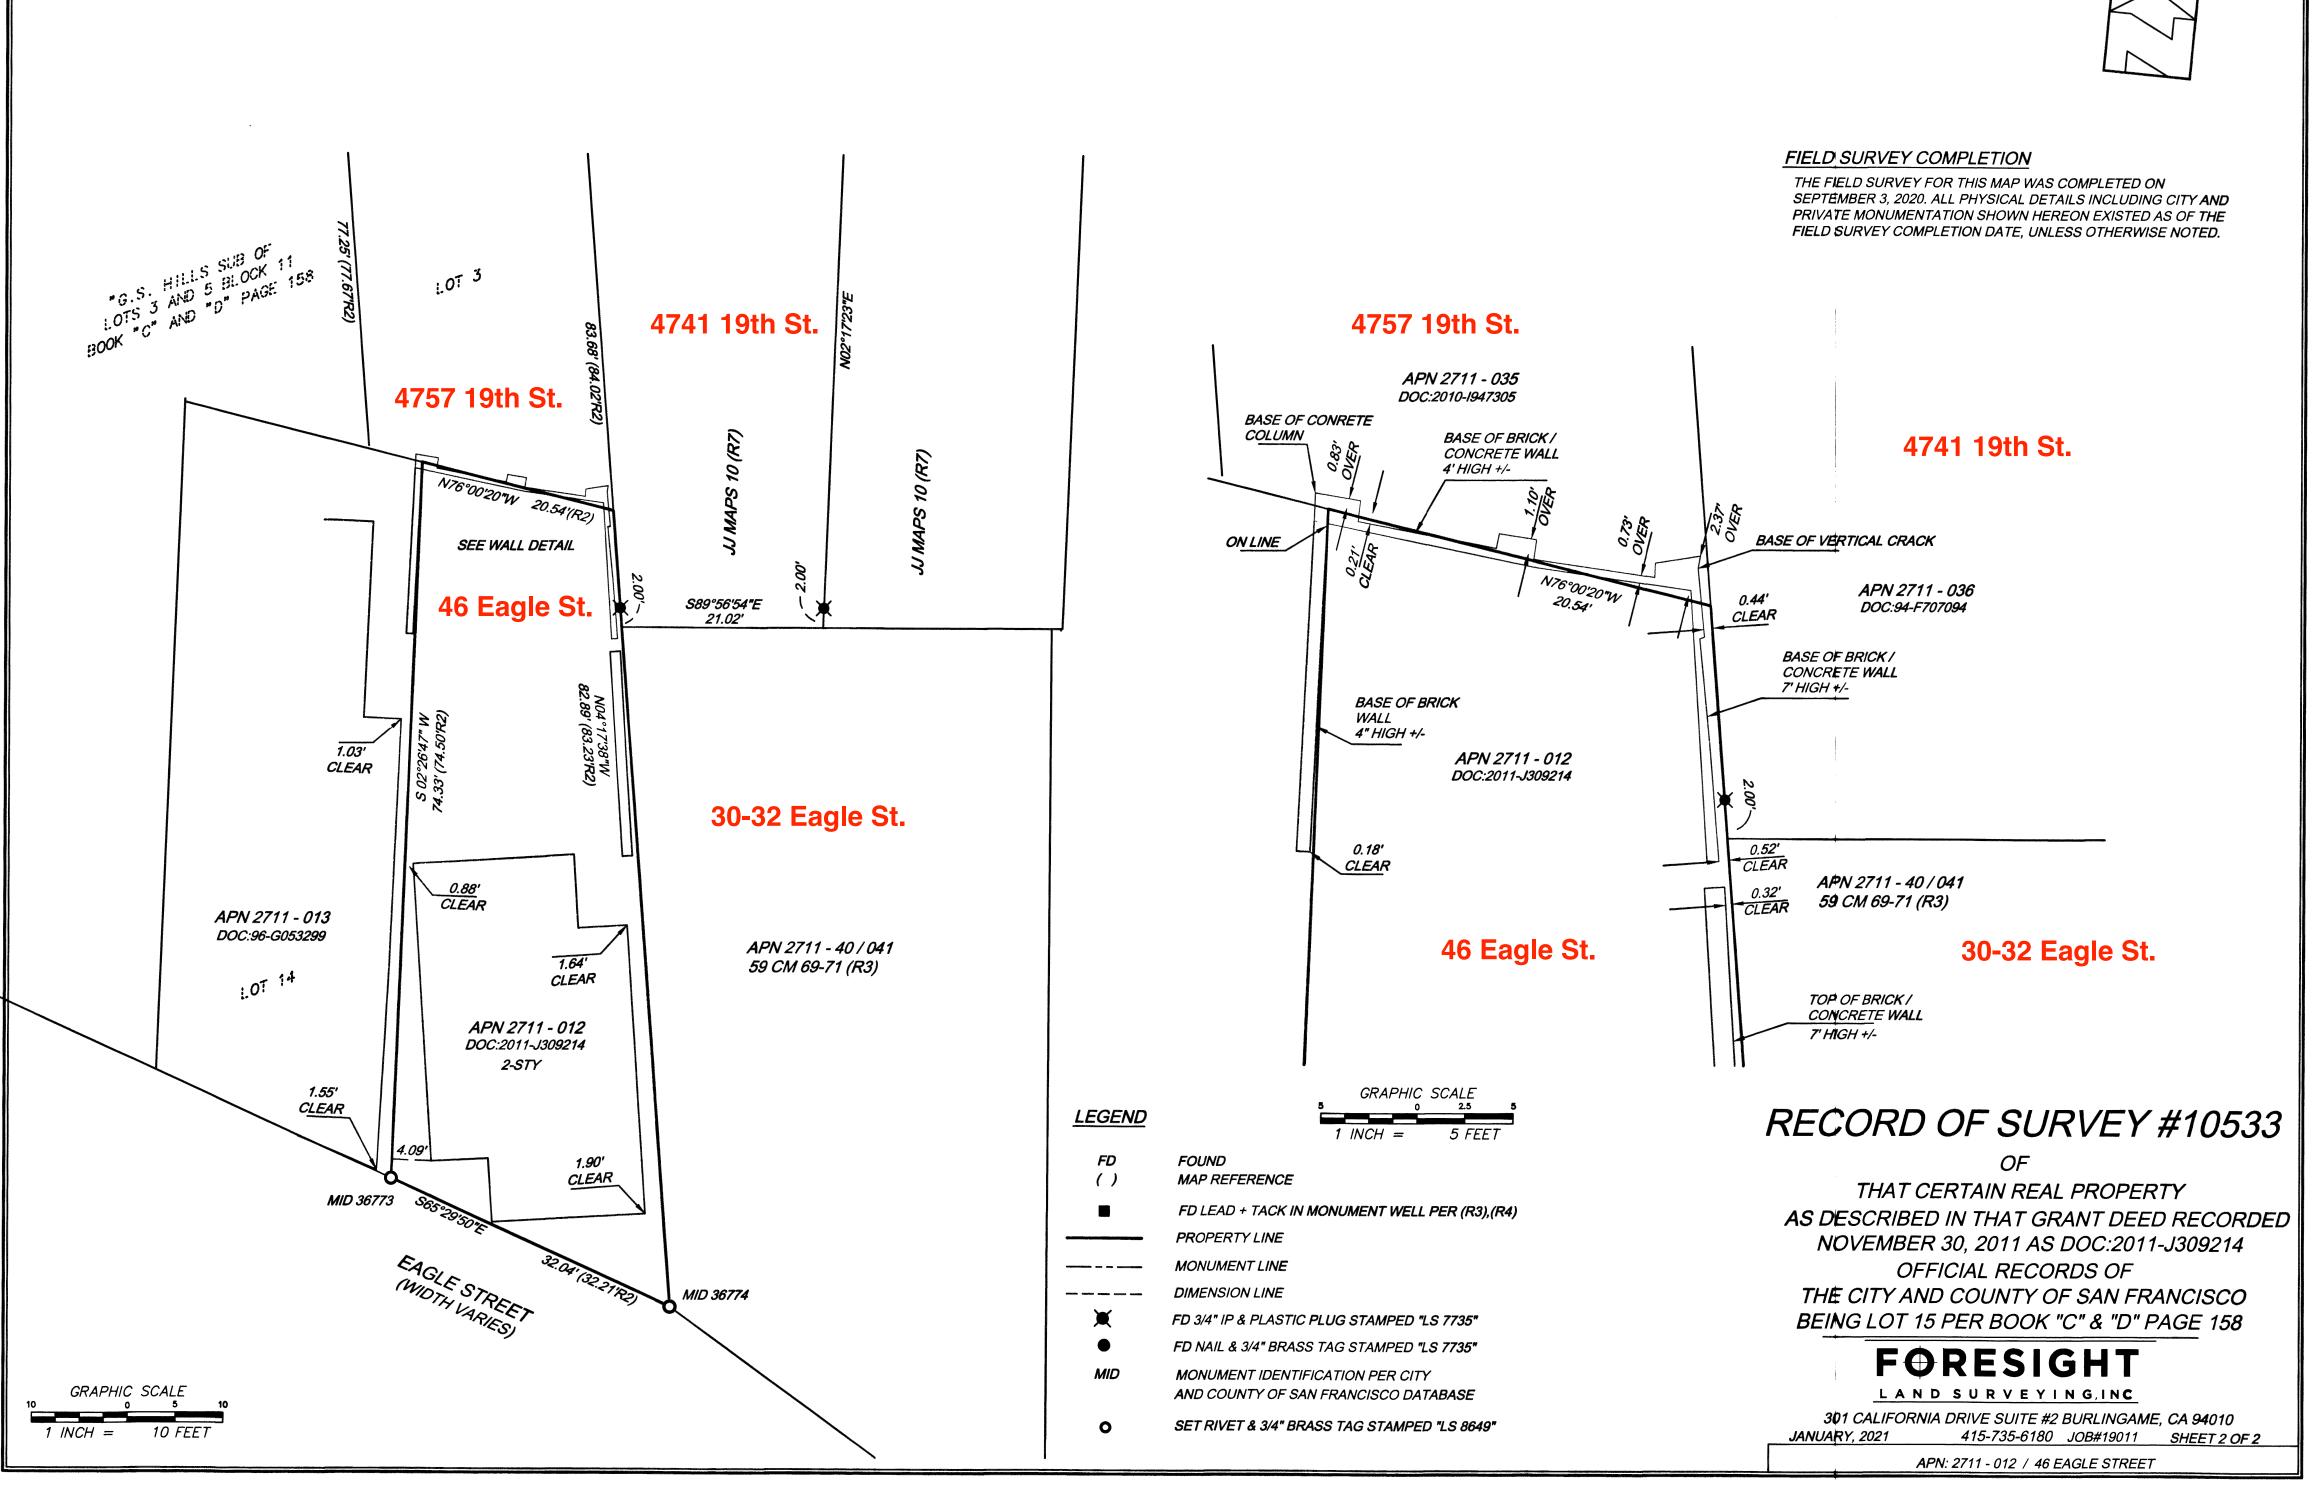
Plans for repair of retaining walls to address NOV 202172279.
